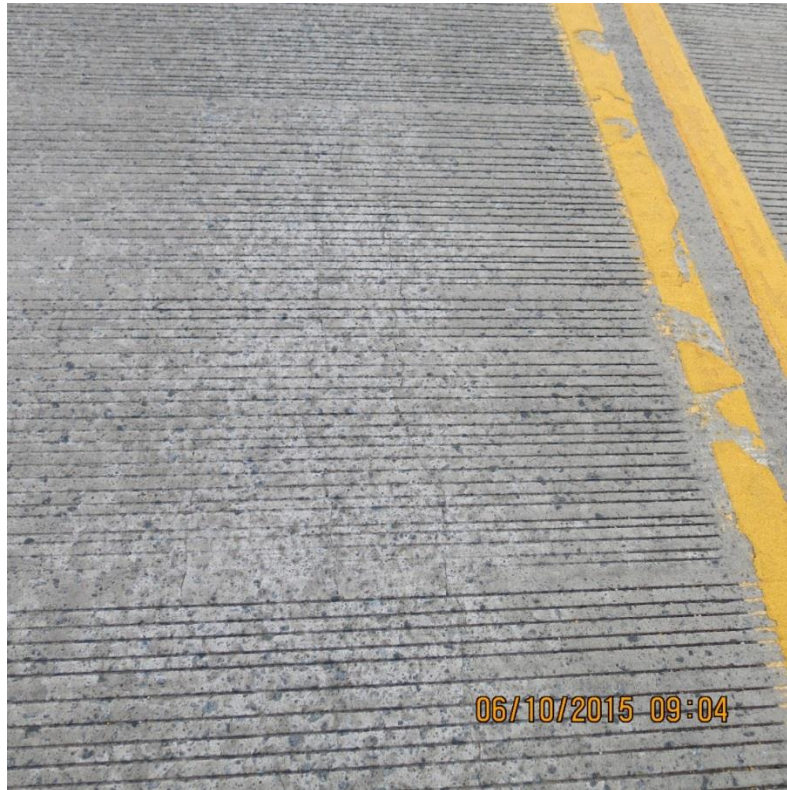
Bridge H-2287 bridge deck with faint cracking visible.
